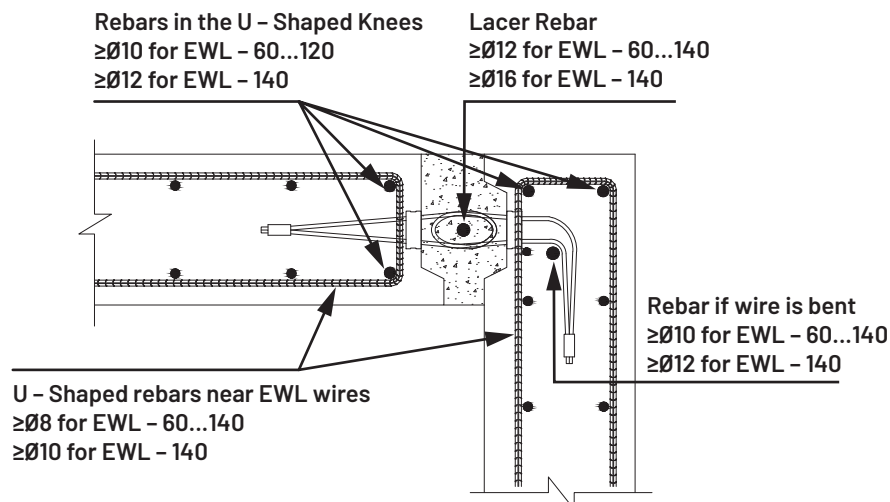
Required reinforcement to utilize maximum load bearing capacity of EWL wire loops
